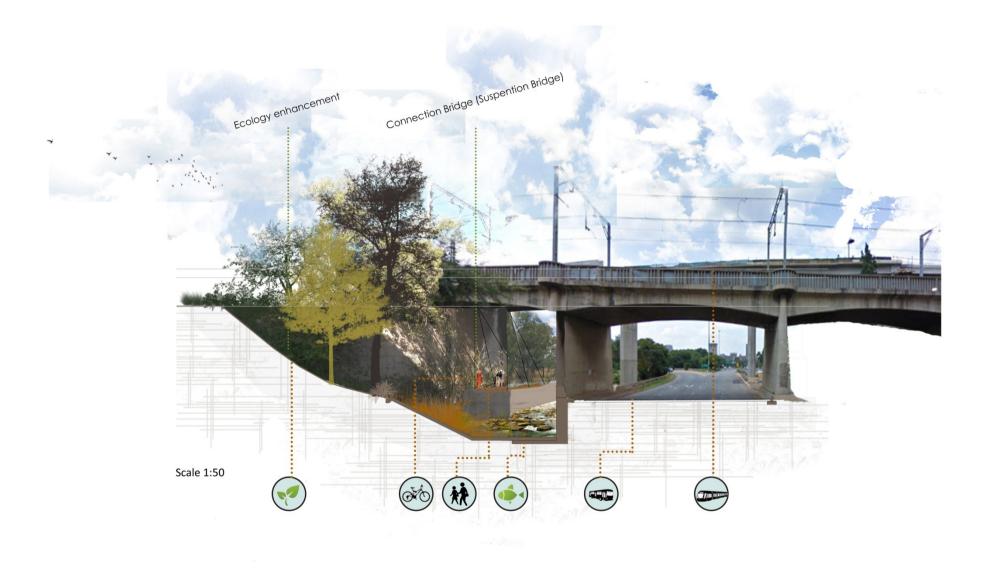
Scenario 2\_Connection to Fountains Valley via Suspension Bridge (Author 2014)
